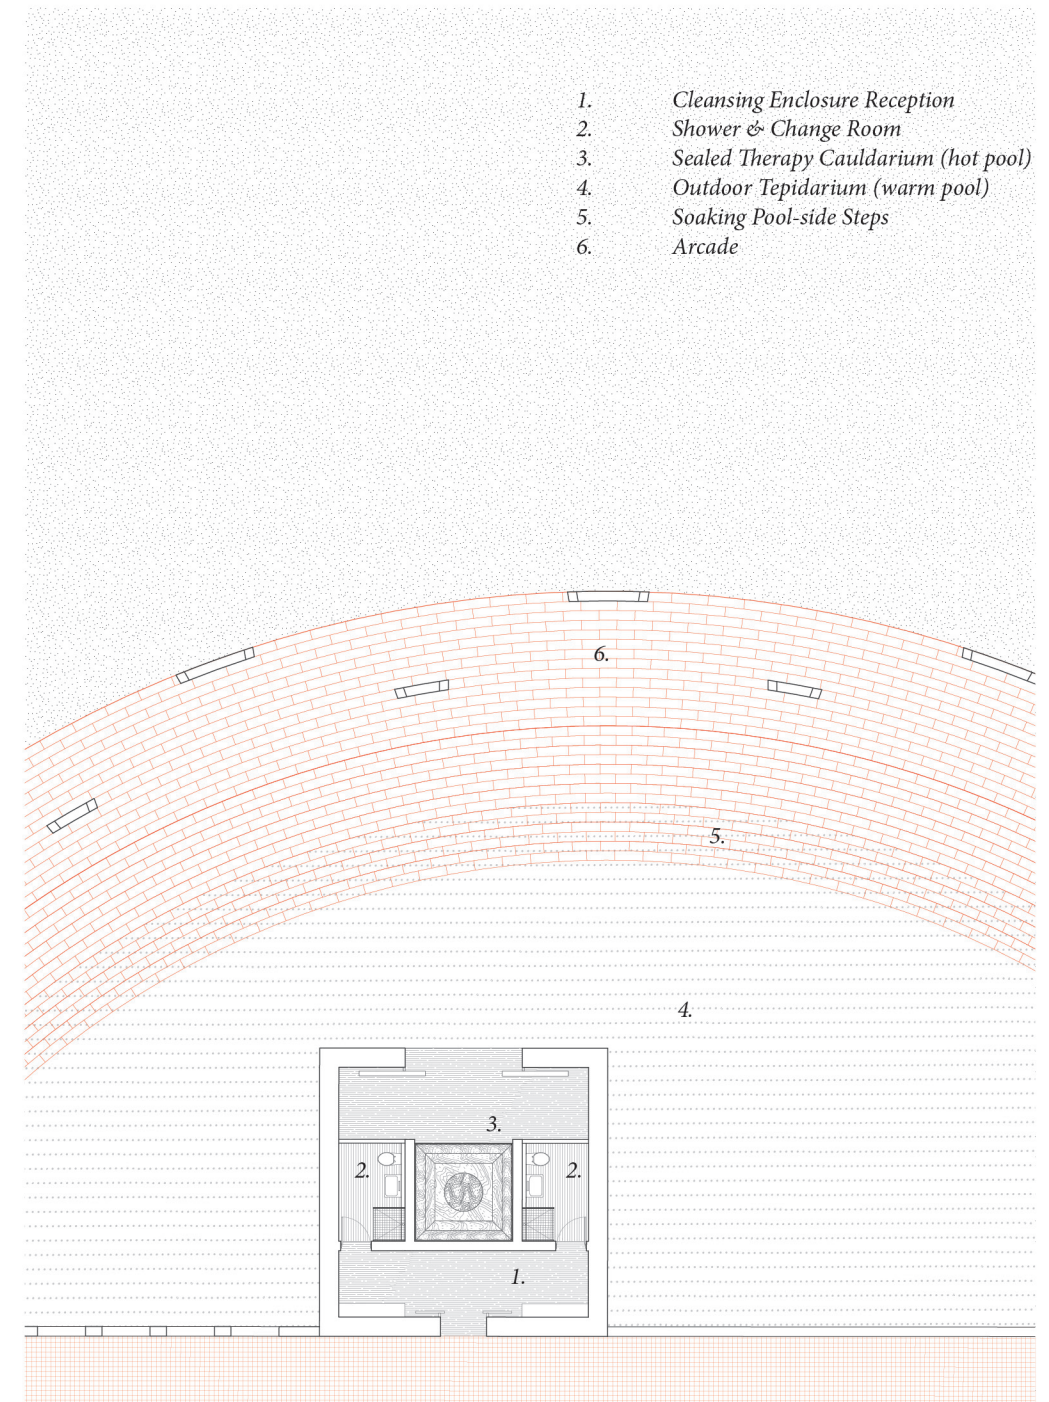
Plan of Bathing Programs. Plan / 1:200.
